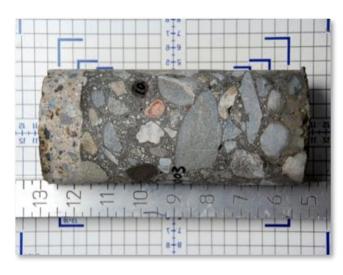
B: Core samples to evaluate concrete reinforcing steel
